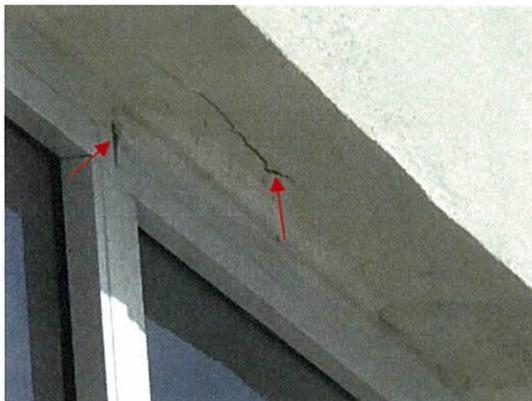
Crack at window header caused by the buffeting of windows due to Irma's wind pressures (1106S). Also, window frame is crack at midpoint.
